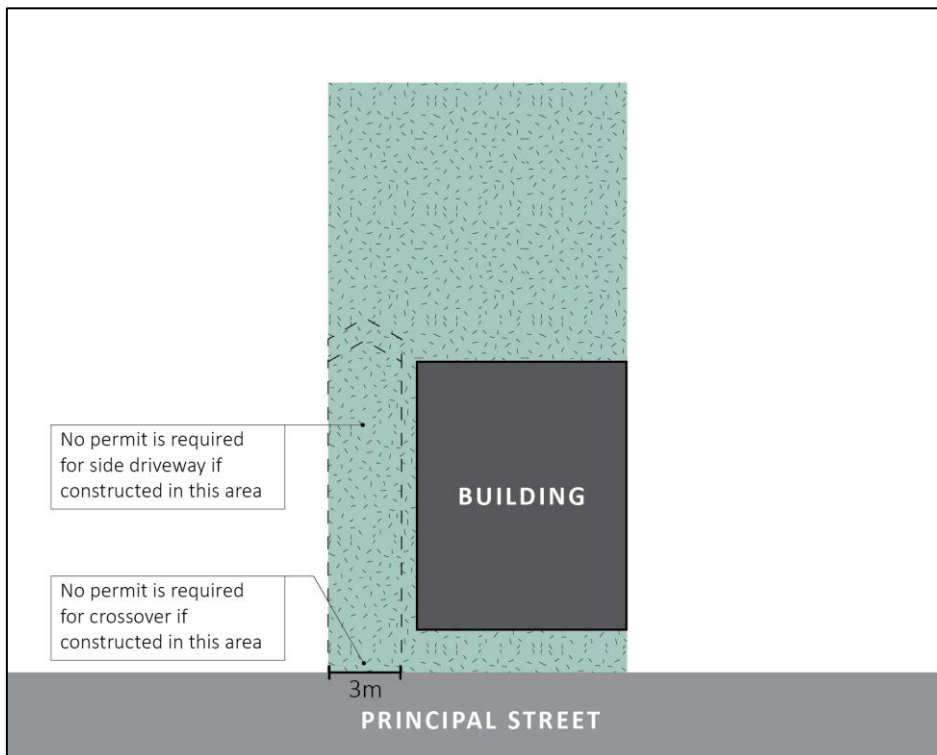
Construction of a new crossover and driveway is permit exempt if constructed in this location.
